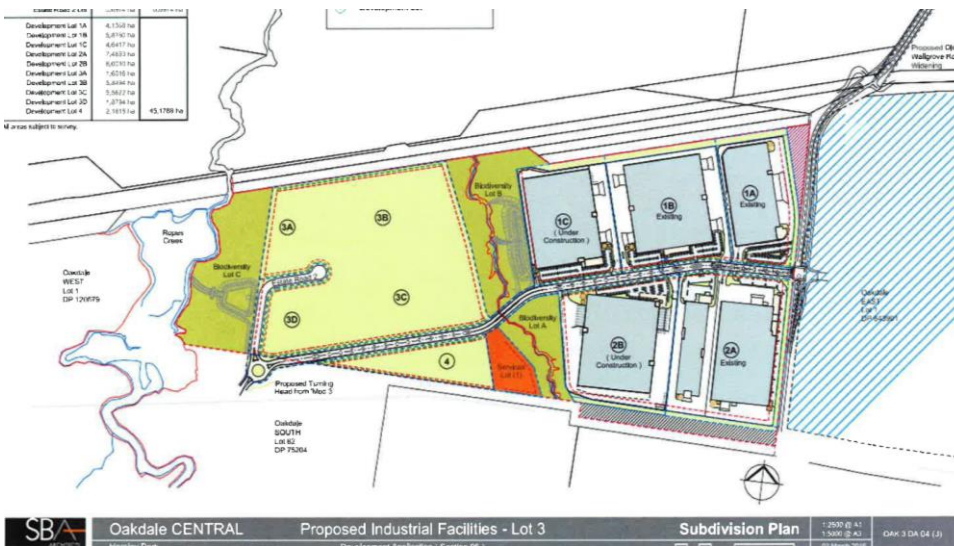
Approved Subdivision Plan (OAK 3 DA 04 (J)) (Appendix A)
